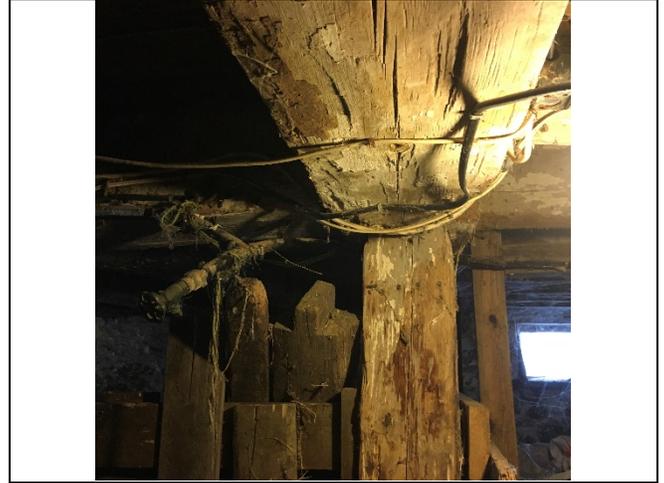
The wood post and floor joist appear to be consistent with the pre-construction assessment.
